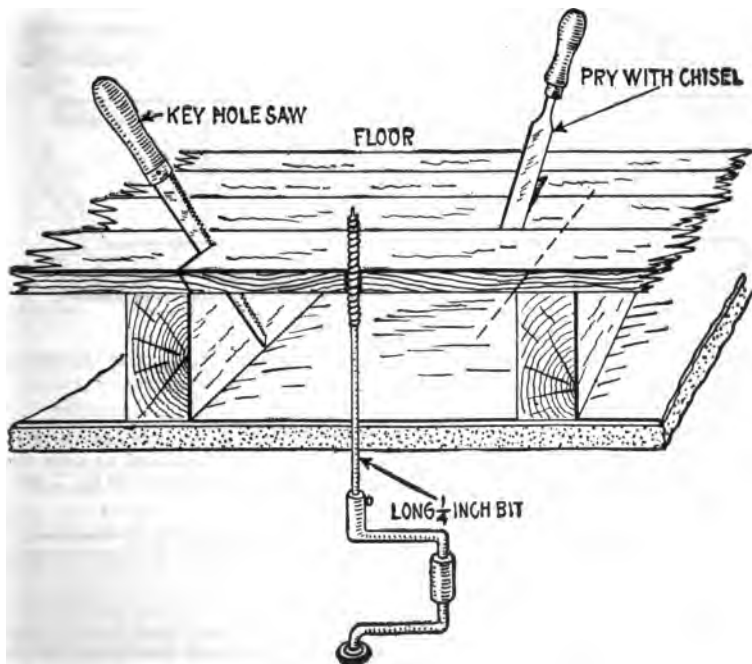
,242.—Sectional view showing method of cutting a pocket or opening in floor for the insertion of wires.
